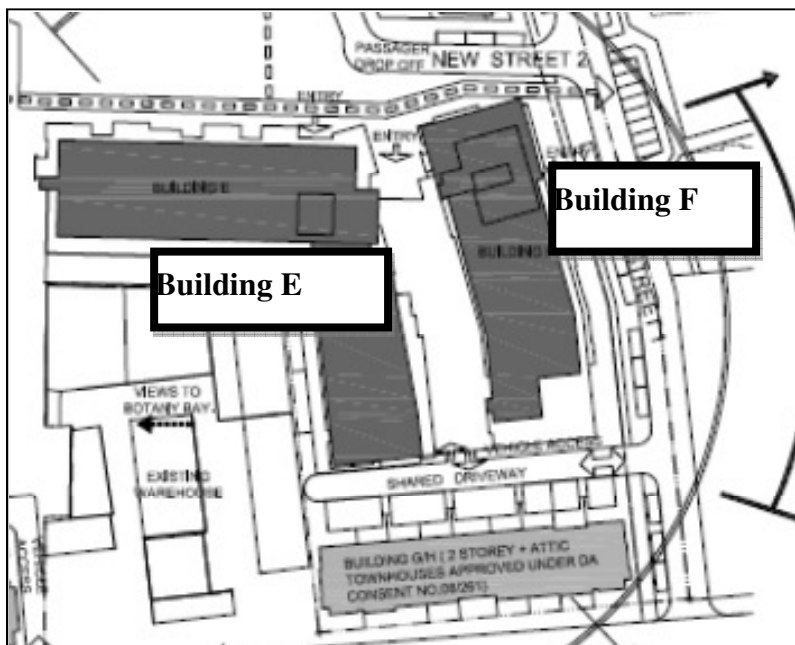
illustrates the position of Building E and F in relation to the approved Park Grove 'Masterplan' development and adjoining sites.
